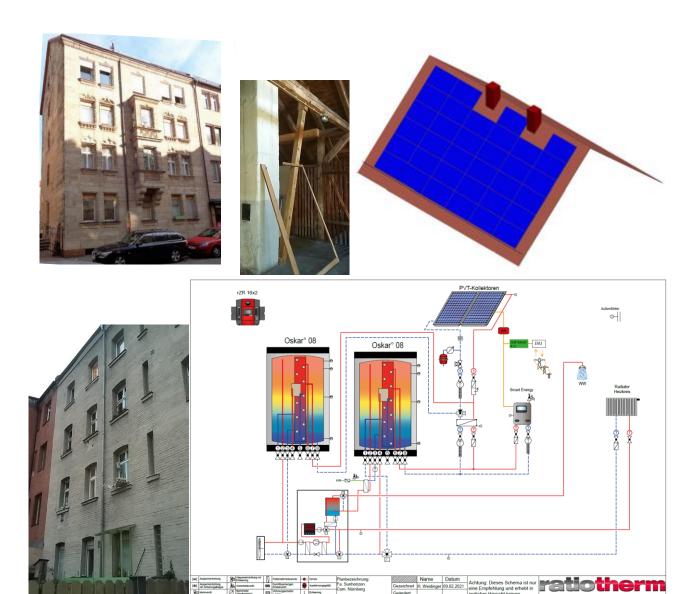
Streetview of the building façade, roof structure to be reinforced to support PVT panels, PVT panels layout on existing roof, view from the co-owned backyard of the rear façade to host the gas chimney, TP2 hydraulic layout
